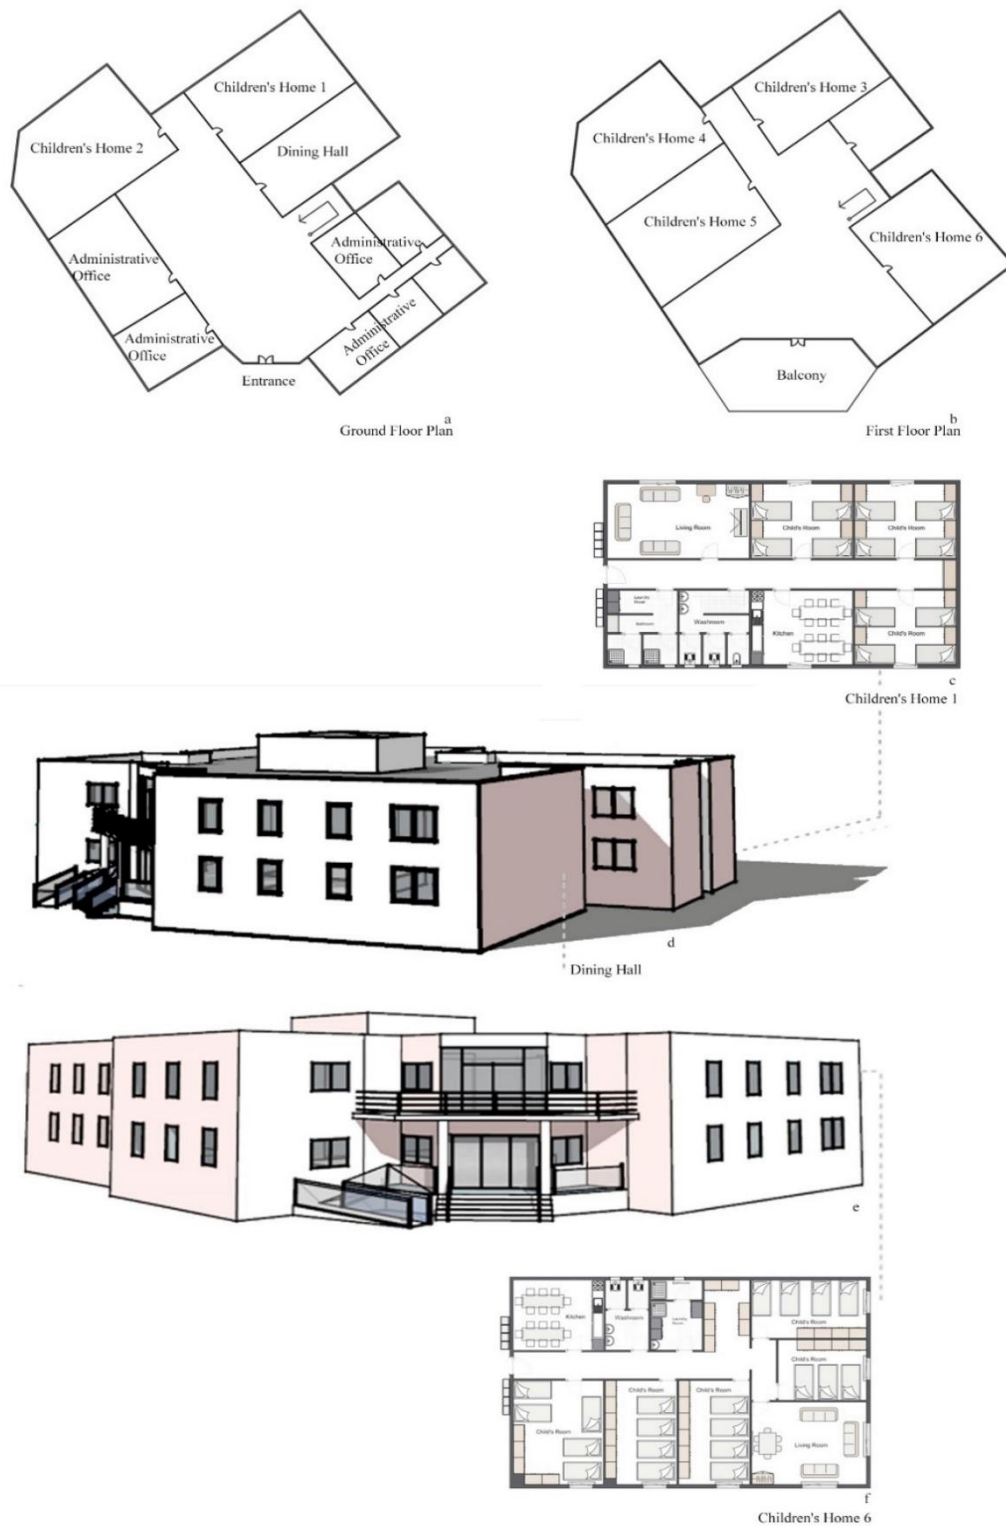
(a) A symbolic ground floor plan of the Campus of Child Houses, (b) A symbolic first-floor plan of the Campus of Child Houses (c) A symbolic floor plan of the Campus of Child Houses located on the ground floor", (d)-(e) A symbolic model of the building in the Campus of Child Houses, (f) A symbolic floor plan of the Campus of Child Houses located on the First floor
